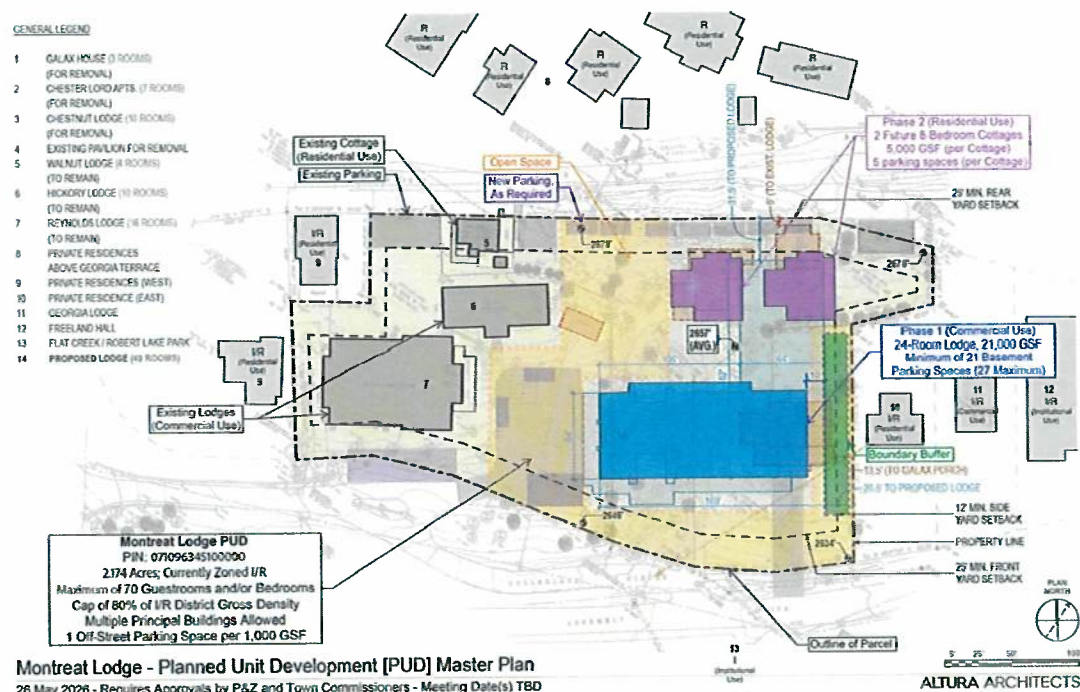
Lodge Expansion 2026 Plan (Source: Client)
